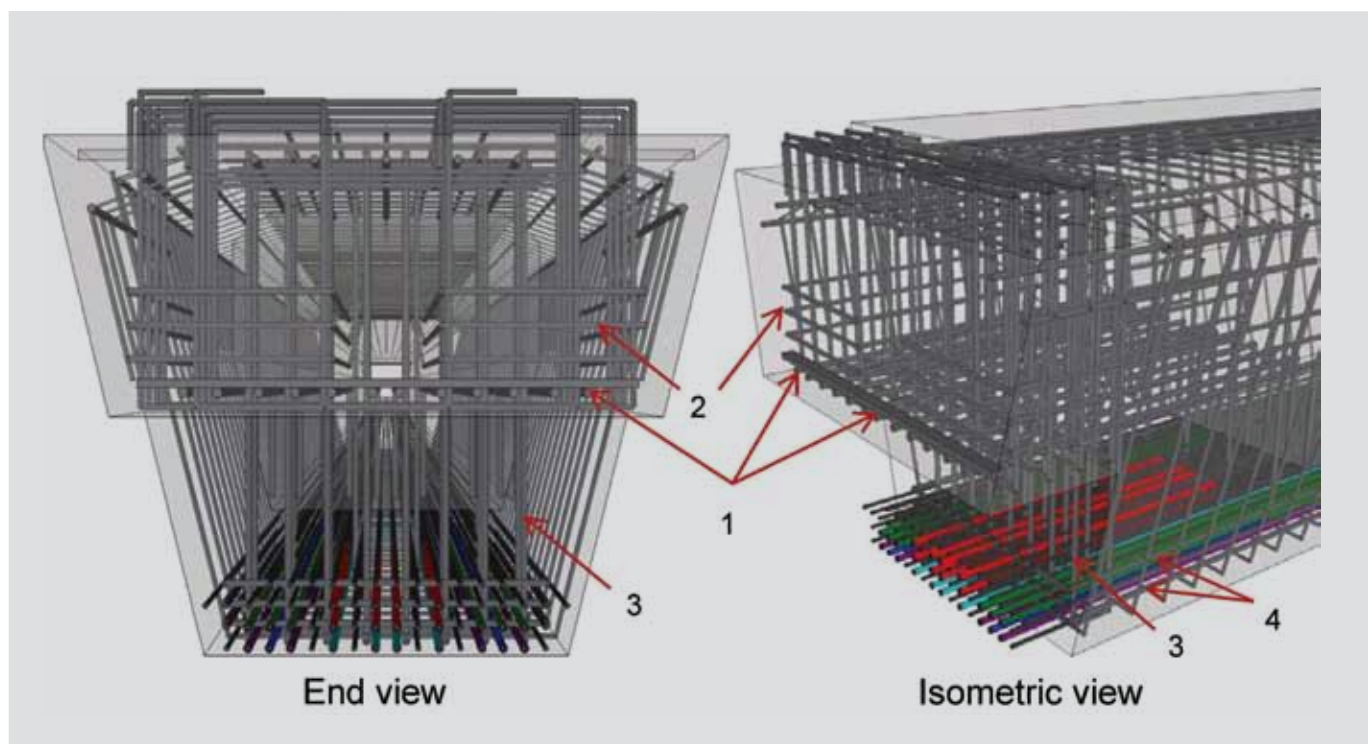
Dapped-end reinforcement configuration. Note: 1 = twelve no. 7 (22M) horizontal dapped reinforcement were welded to a plate at the end face and anchored with a 90-degree hook 2 in. (50 mm) from the inner face of the end block; 2 = additional horizontal no. 5 (16M) hooked bars at 3 in. (76 mm) were provided up to two-thirds of the dap height to help prevent cracking at the reentrant corner; 3 = eight no. 6 (19M) vertical (hanger) reinforcement loops located near the reentrant corner extended down through the prestressing strands; 4 = three no. 6 (19M) bent bars were placed at the bottom of the beam to help provide confinement.
